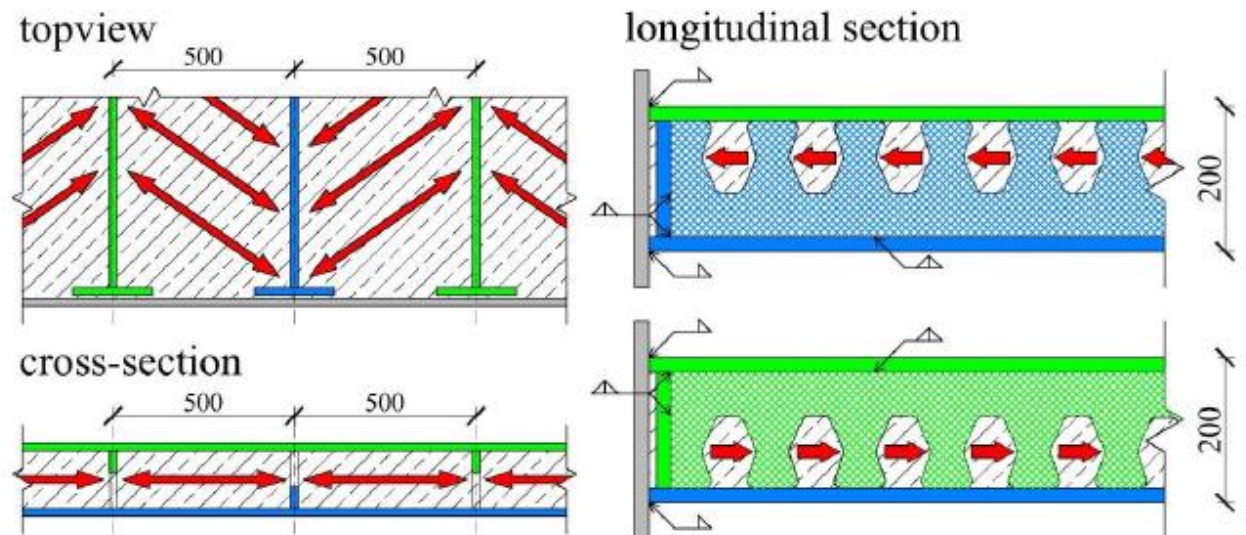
SCSC plate with compression diagonal within the unreinforced concrete core
